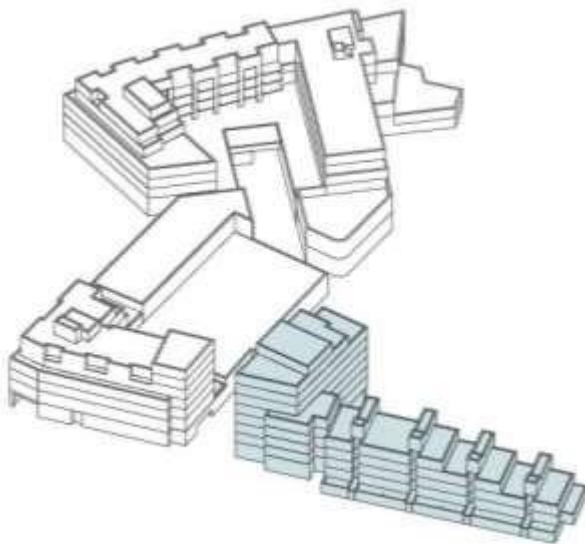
(above left): Site diagram showing Block A highlighted in blue. Figure 11 (above right): Visualisation looking west along Daneville Road, showing the south elevation of Block A; visible in the background is the taller element at the corner of Wren Road and Daneville Road.
